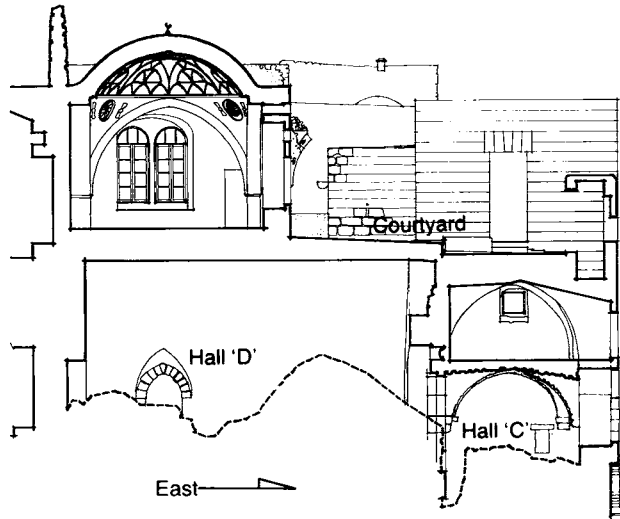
West–east section through halls 'D' and 'C' and upper floor courtyard looking north
